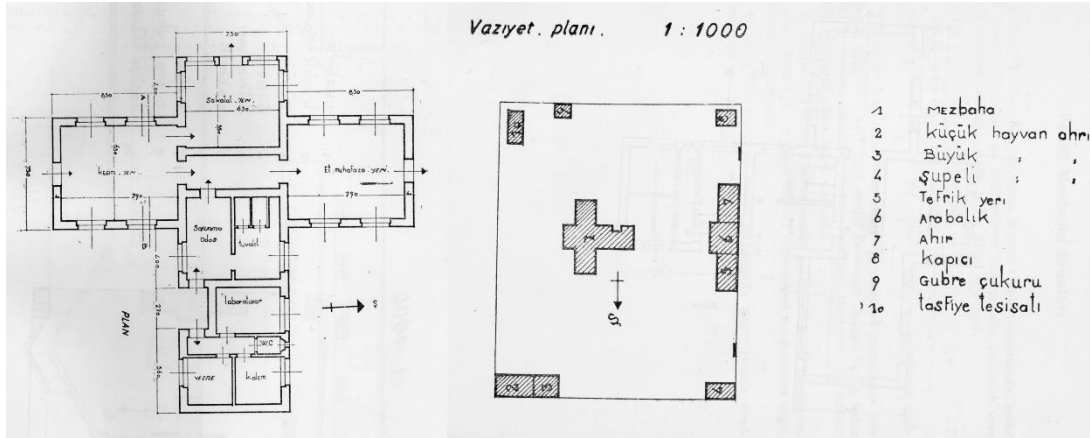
Ground floor plan and Site Plan of type-2 slaughterhouse (Source: T.C. Bayındırlık Bakanlığı Bayındırlık İşleri Dergisi Yönetmel Kısım. (1935). 'Fennî Mezbahe Binaları' 1(12), pp. 86-89.)
